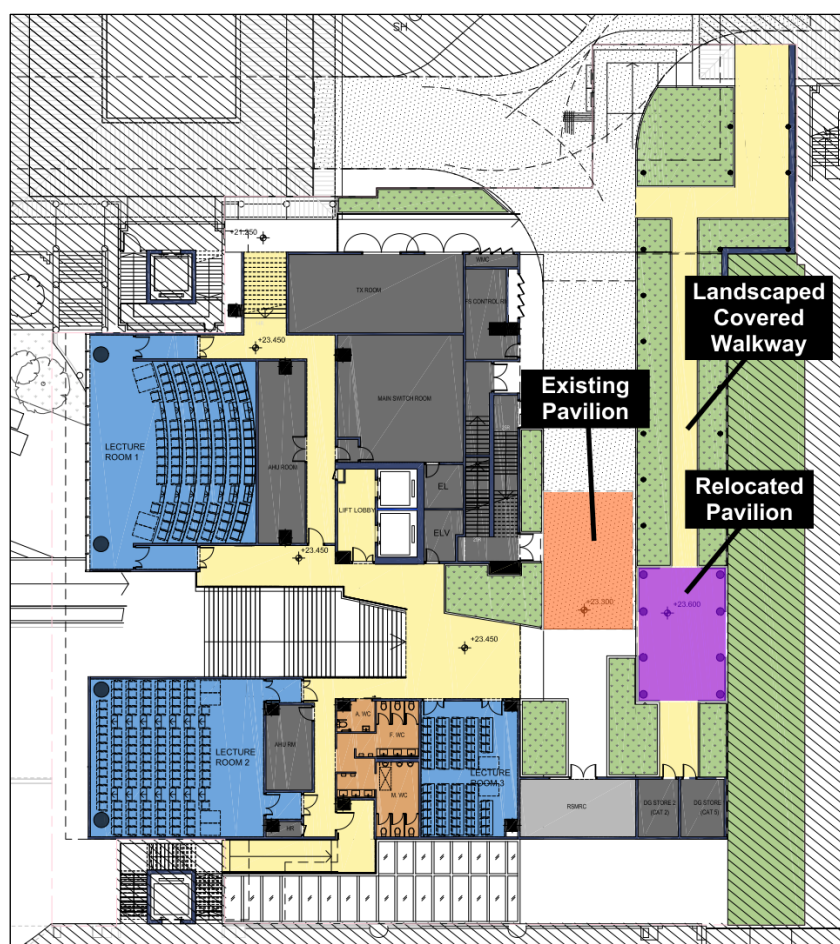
Relocated Pavilion with Landscaped Covered Walkway
